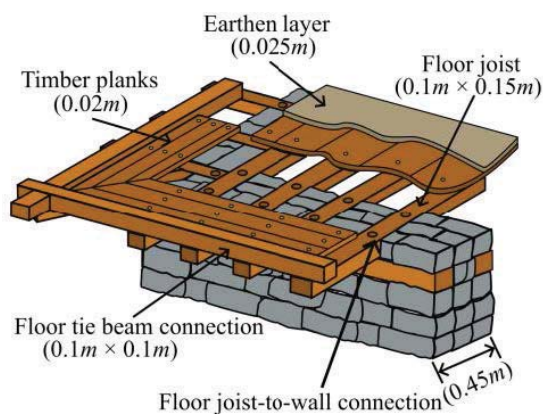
Typical sketch of the floor system in Kath-kunni buildings
